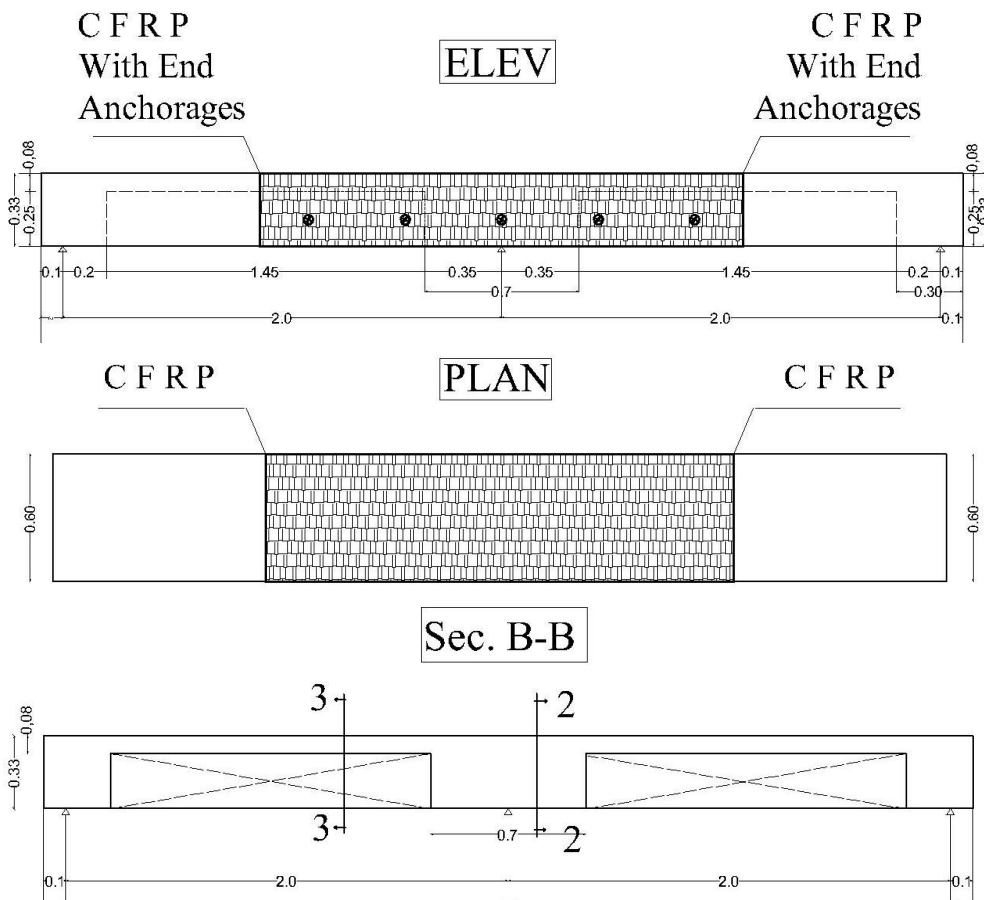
Concrete dimensions and reinforcement detailing of both groups.
